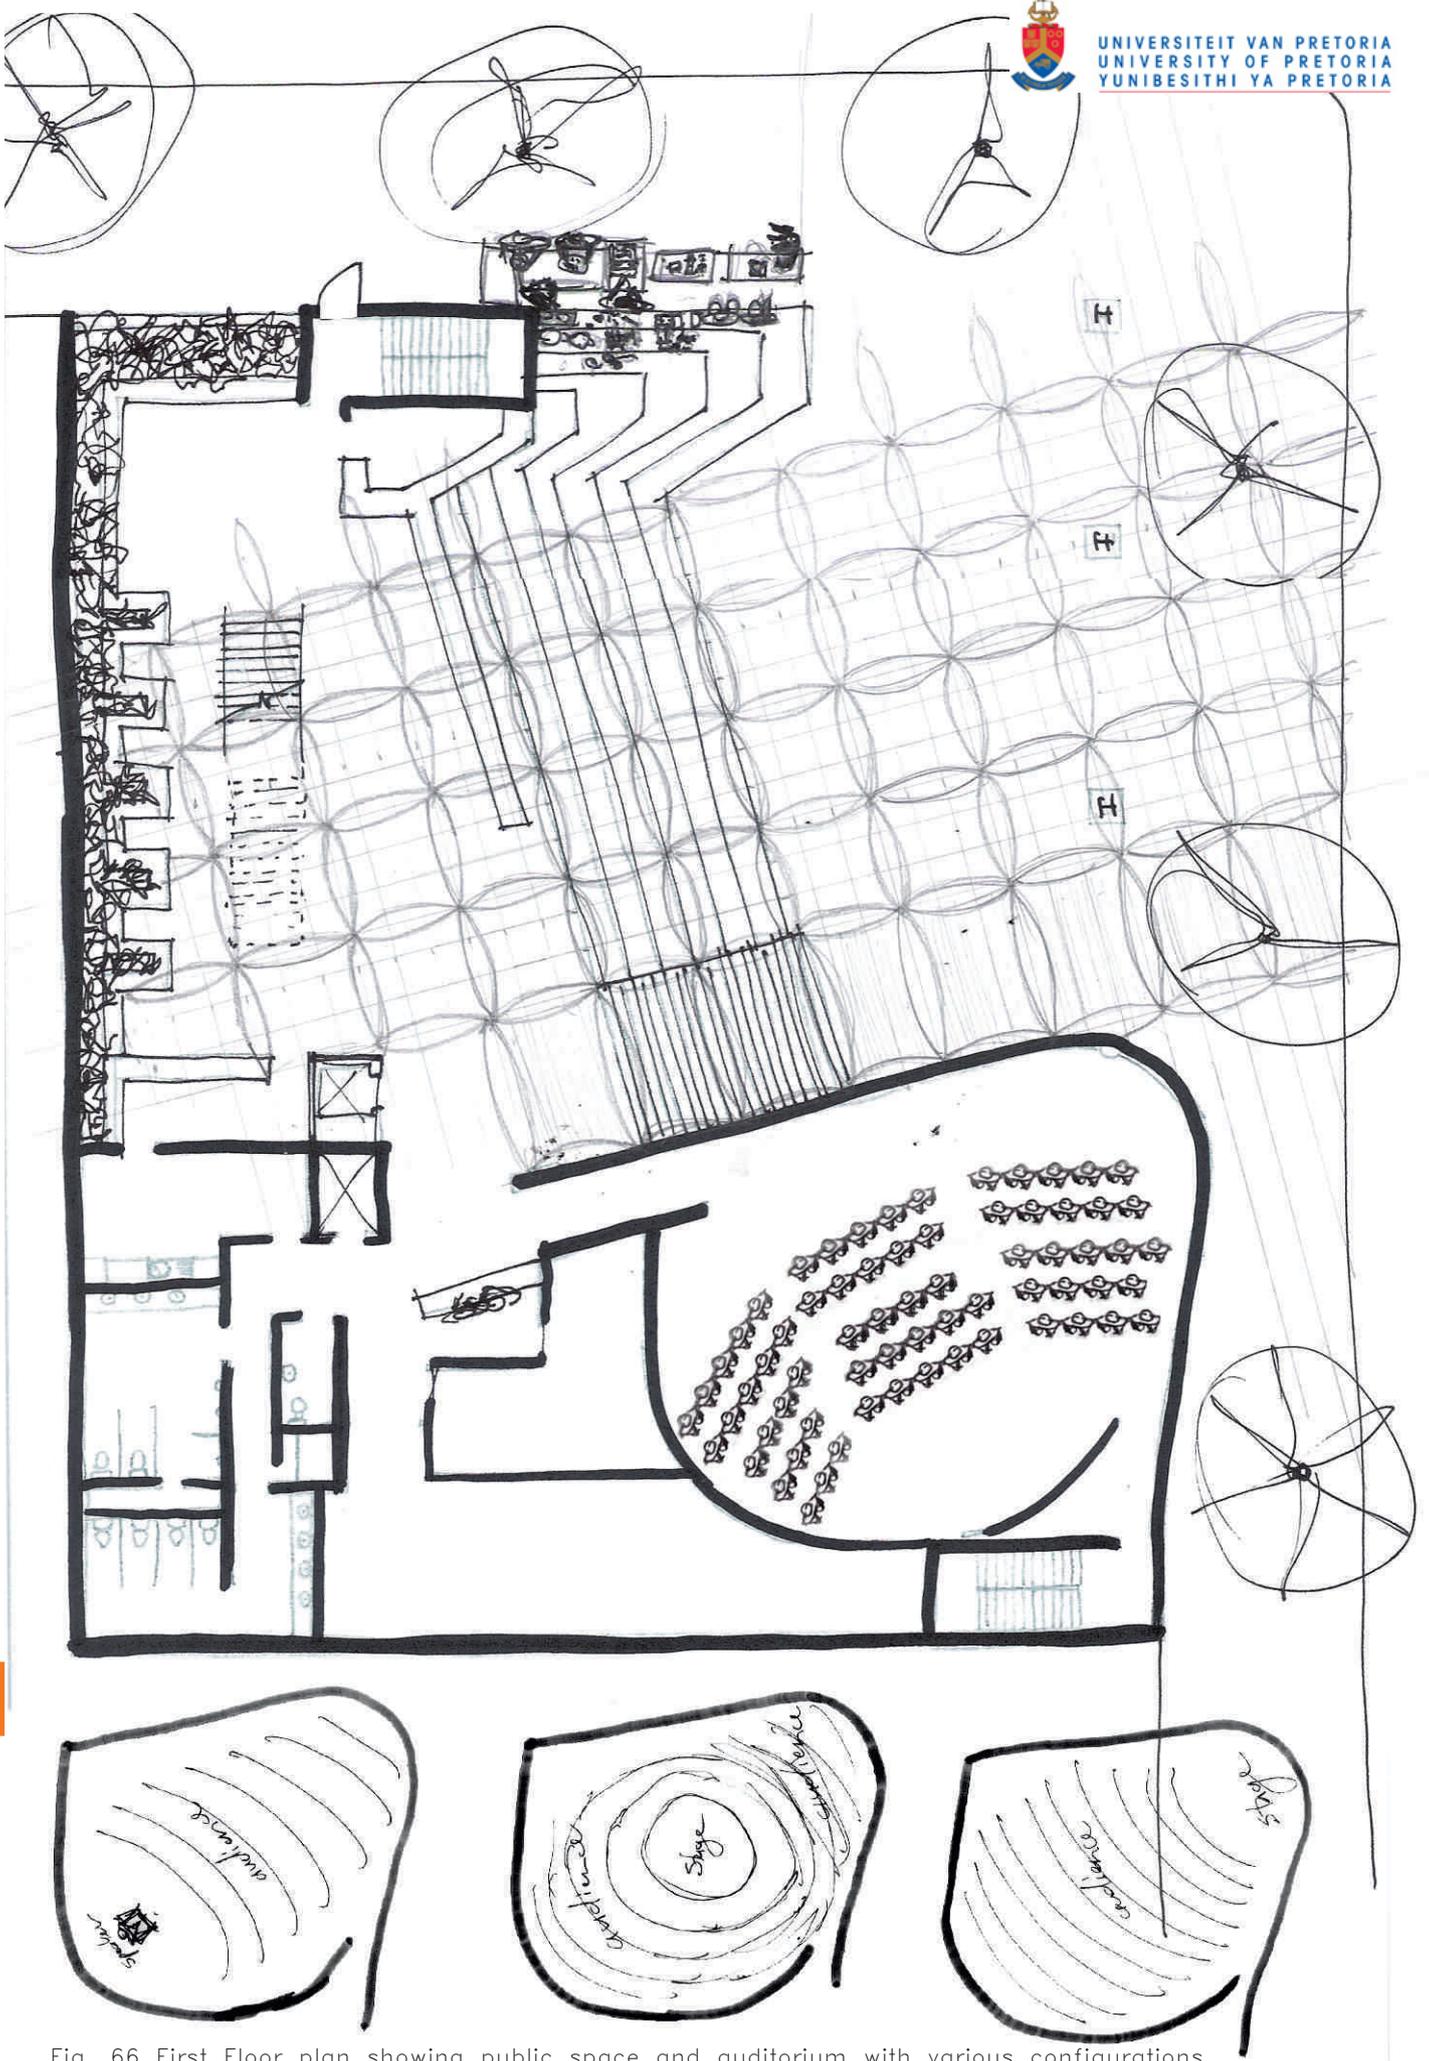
First Floor plan showing public space and auditorium with various configurations
